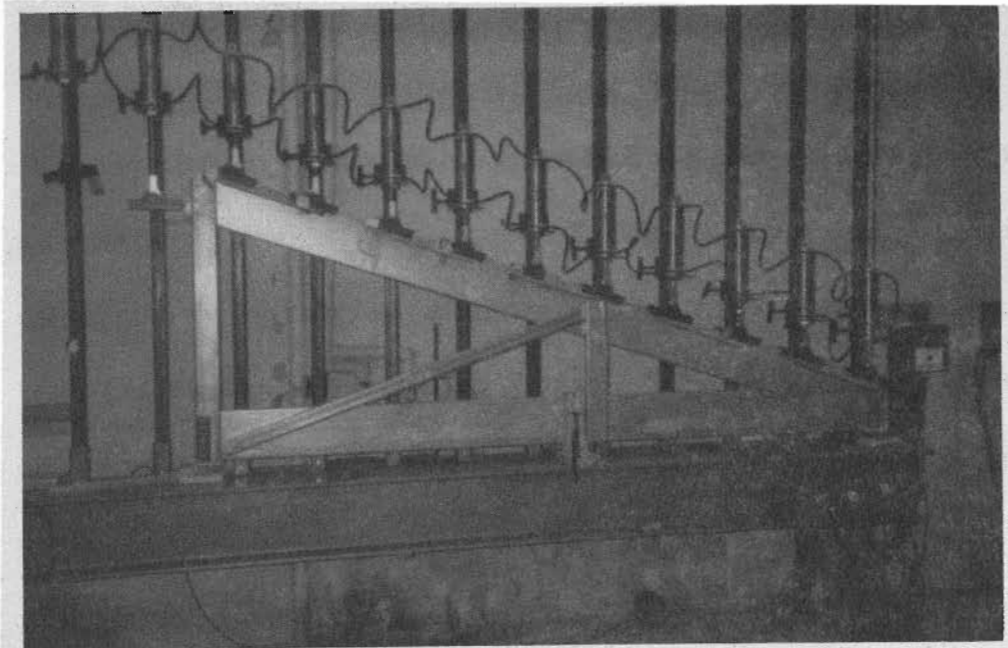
Connection of Hydraulic Jacks to Truss Assembly
